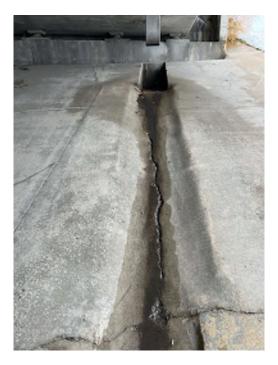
NE drain gutter typical wide cracking on slope paving
